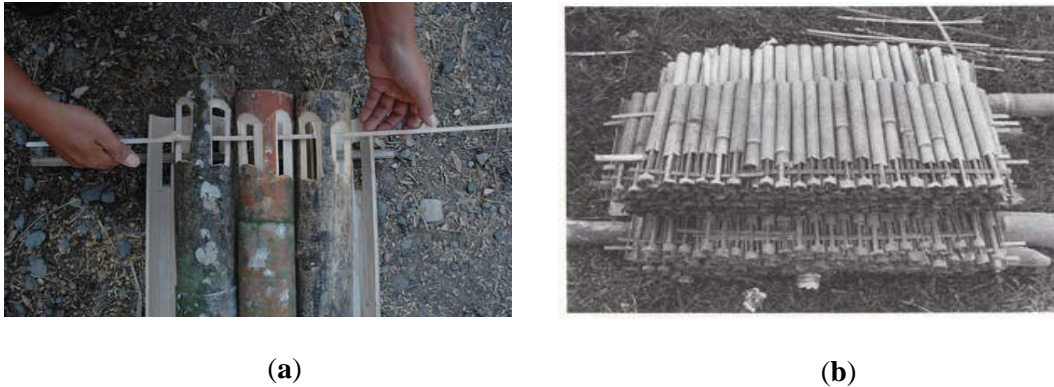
Module joint technique in roof cover: (a) Bamboo stacking assembly process; (b) The final result of the bamboo assembly which consists of several layers
